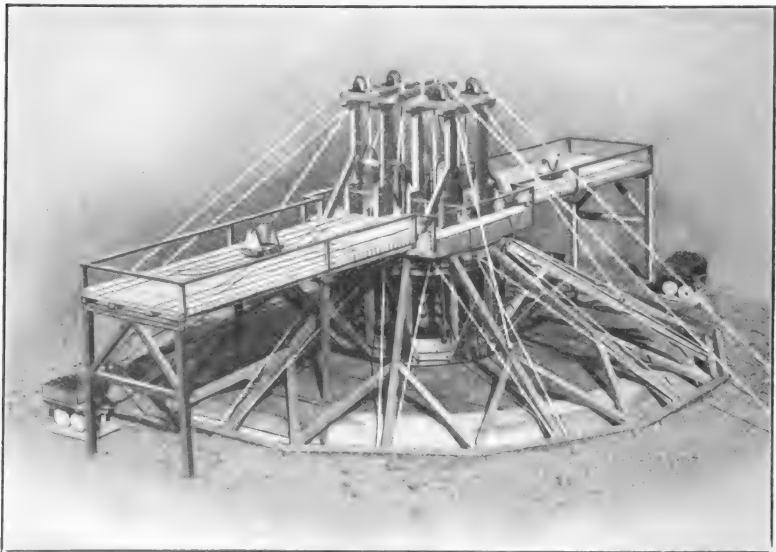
Sinking with Walker's Piling and Sand Tubbing. General View of Surface, showing Suspension-Ring, Supports, &c.
